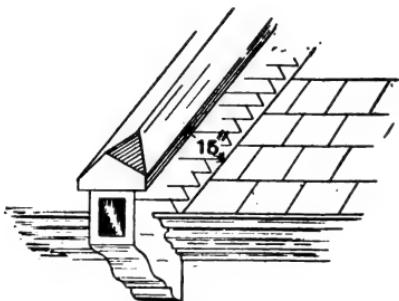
Party Wall Corbelled out and Carried above Eaves.
